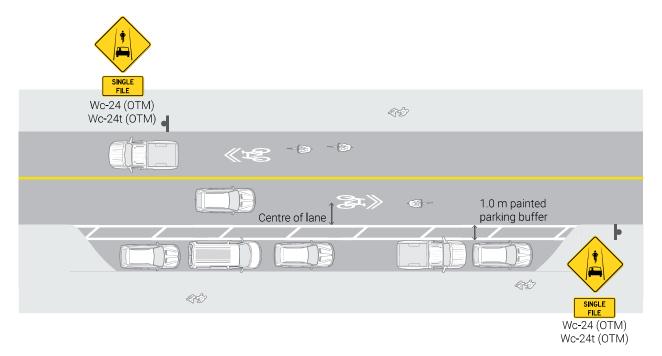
Mixed Traffic Operation with On-Street Parking
